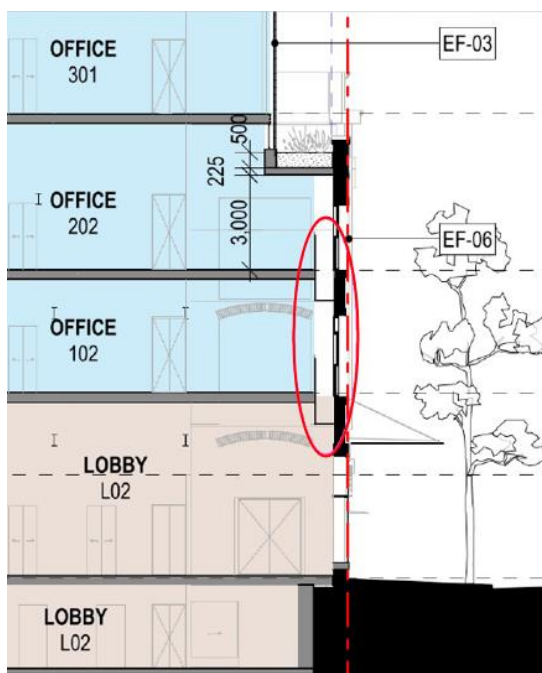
Proposed section through 14 Wentworth Avenue, with floors that do not meet the existing facade circled in red
